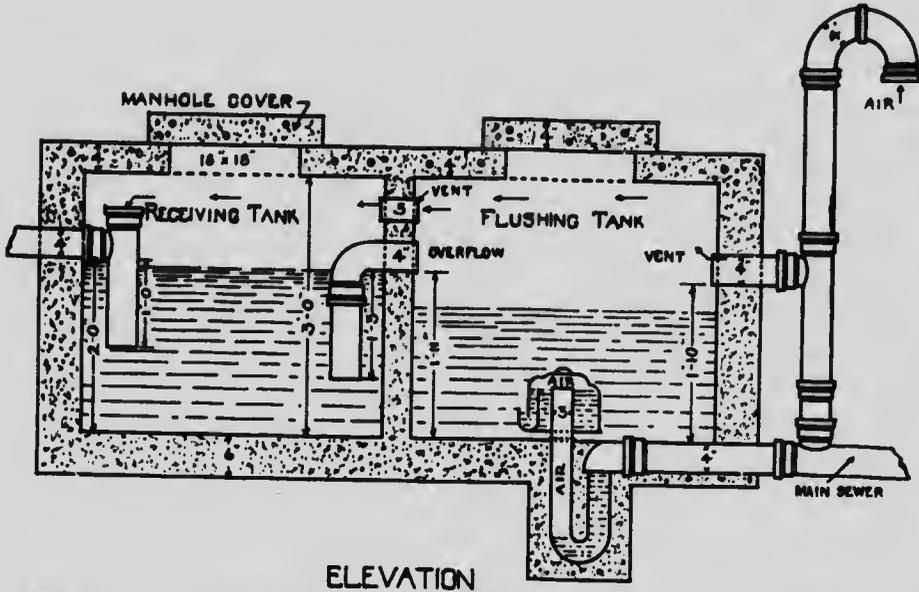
(a) Section of septic tank with Miller siphon valve, showing details of construction.
